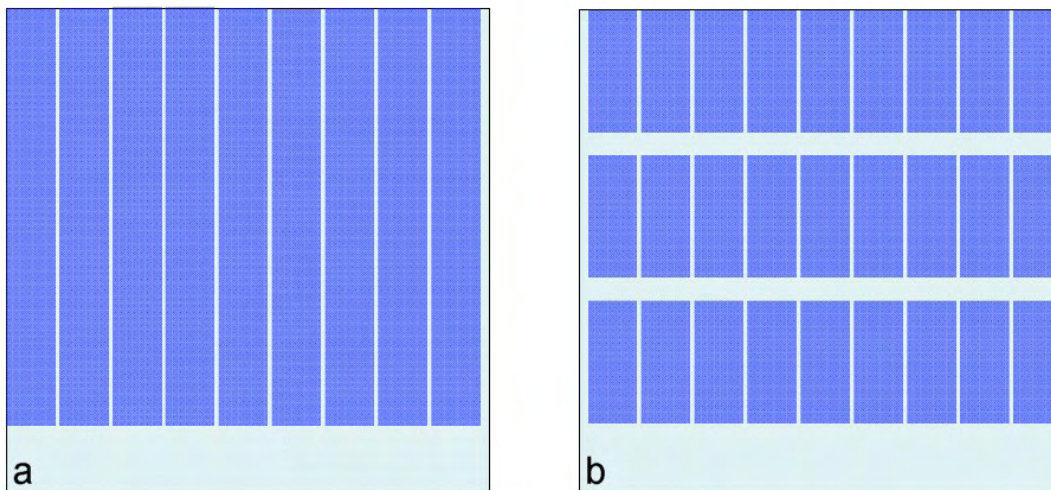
Array of ducts on part of a facade: a long ducts b short ducts
